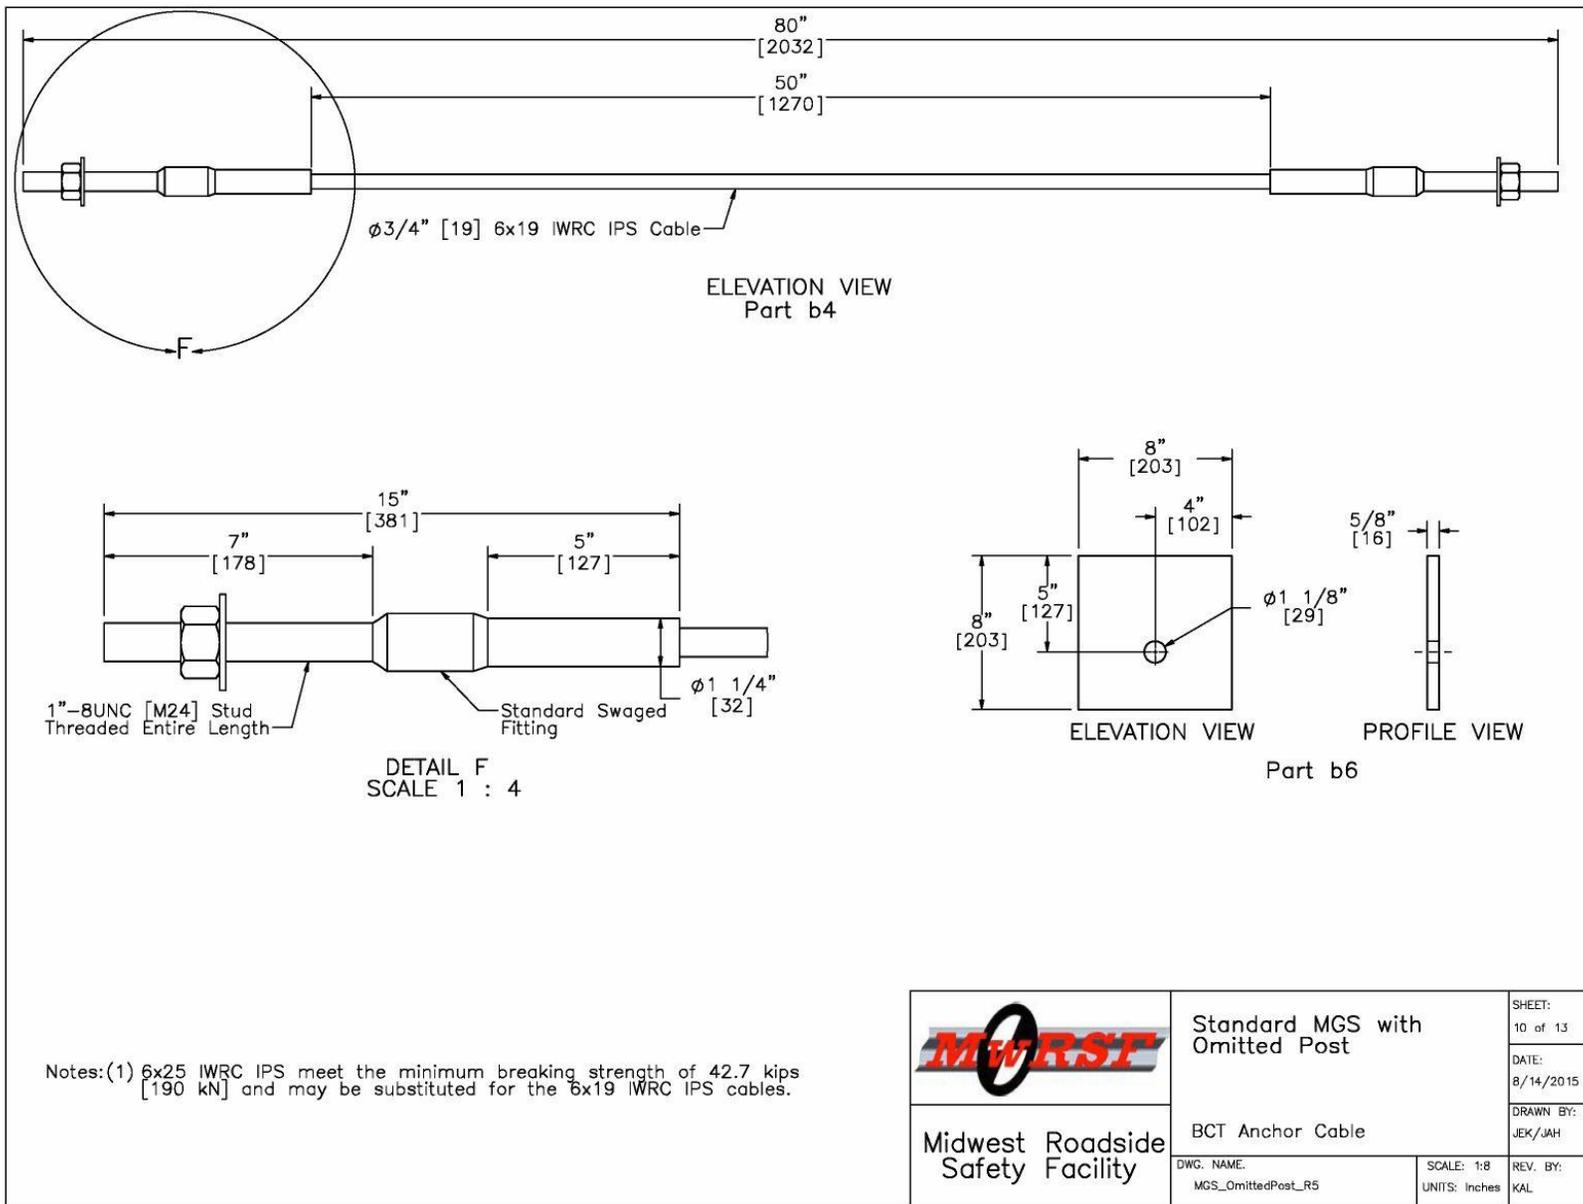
BCT Anchor Cable, Test No. MGSMP-1
